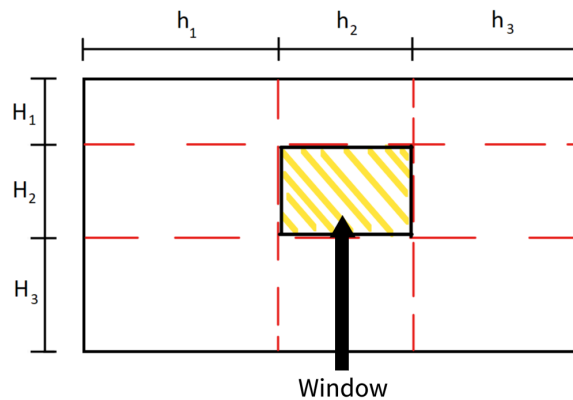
Notations of length parameters used in the evaluation of openings in shear wall. Inner rectangle is an opening in a wall.
